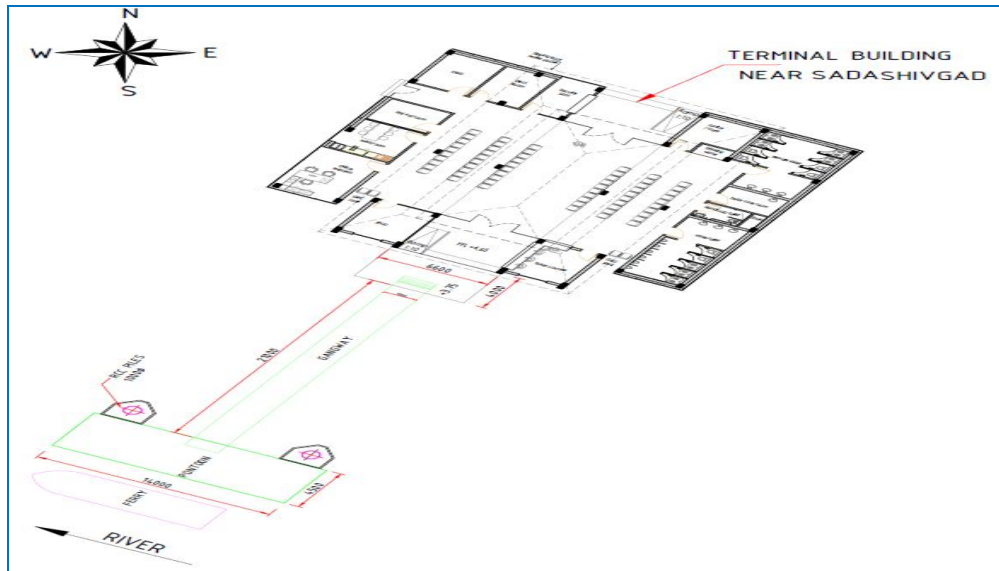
Overall site plan of proposed ferry terminal at Sadasivgad & Katne.
